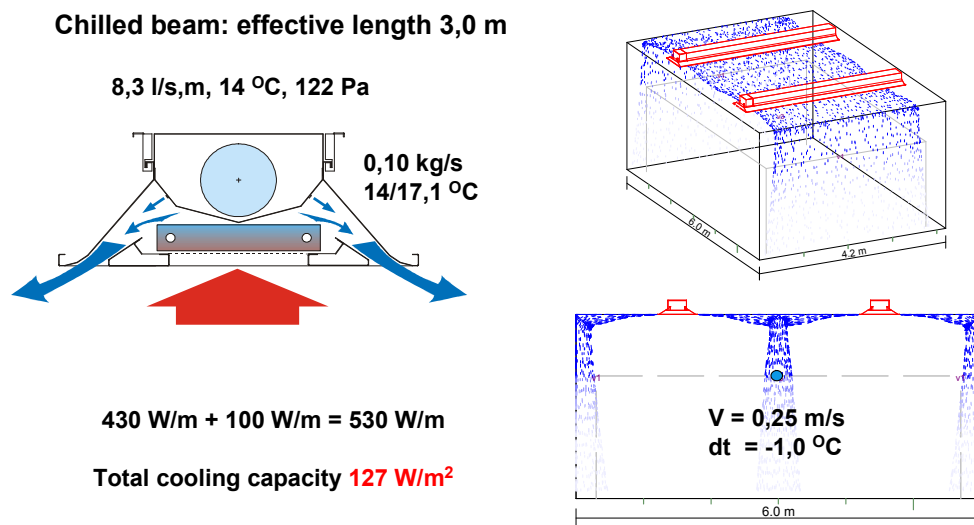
Typical chilled beam design to maximise cooling per floor area.
